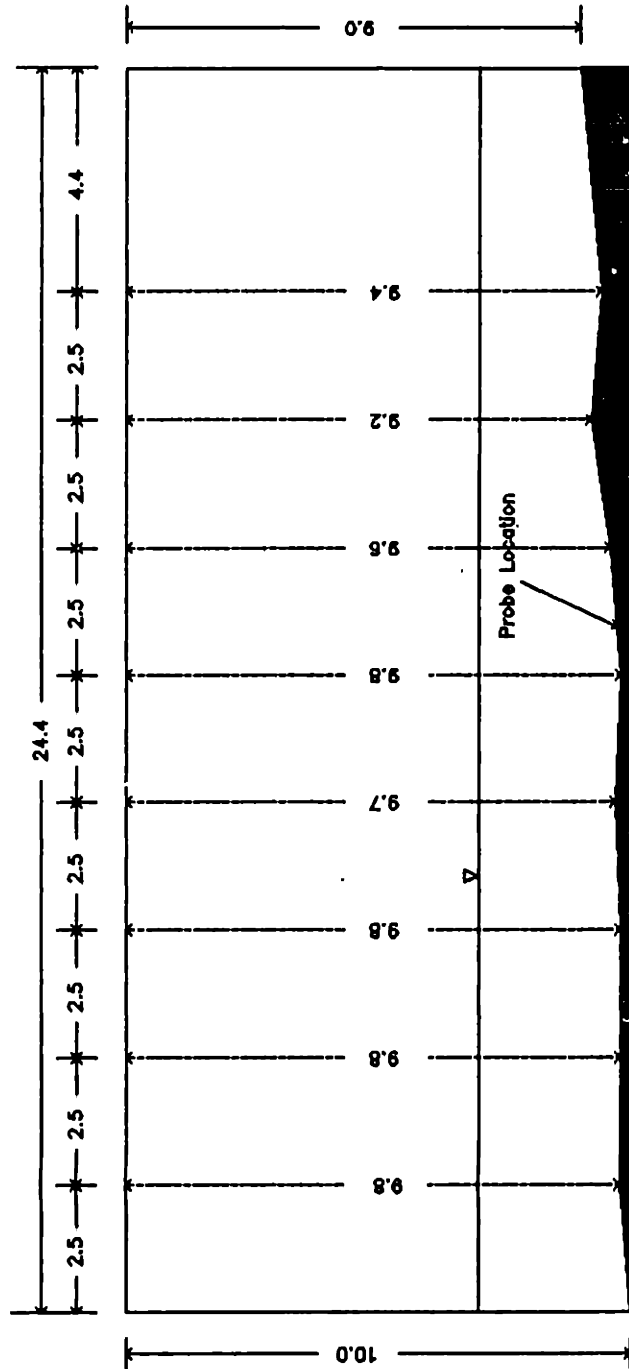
Cross-Section of the Aberjona River at the Upstream Face of the Montvale Avenue Bridge at Streamgauge Site 3.
